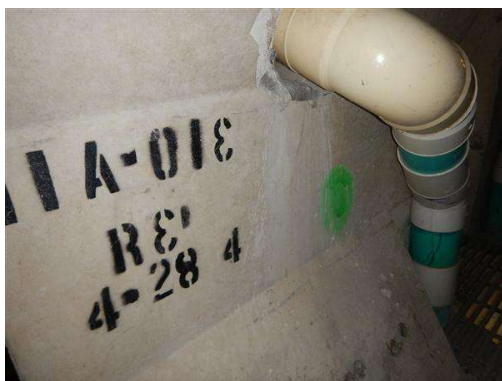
Interior drainage pipe at Pier 11A, efflorescence in concrete
